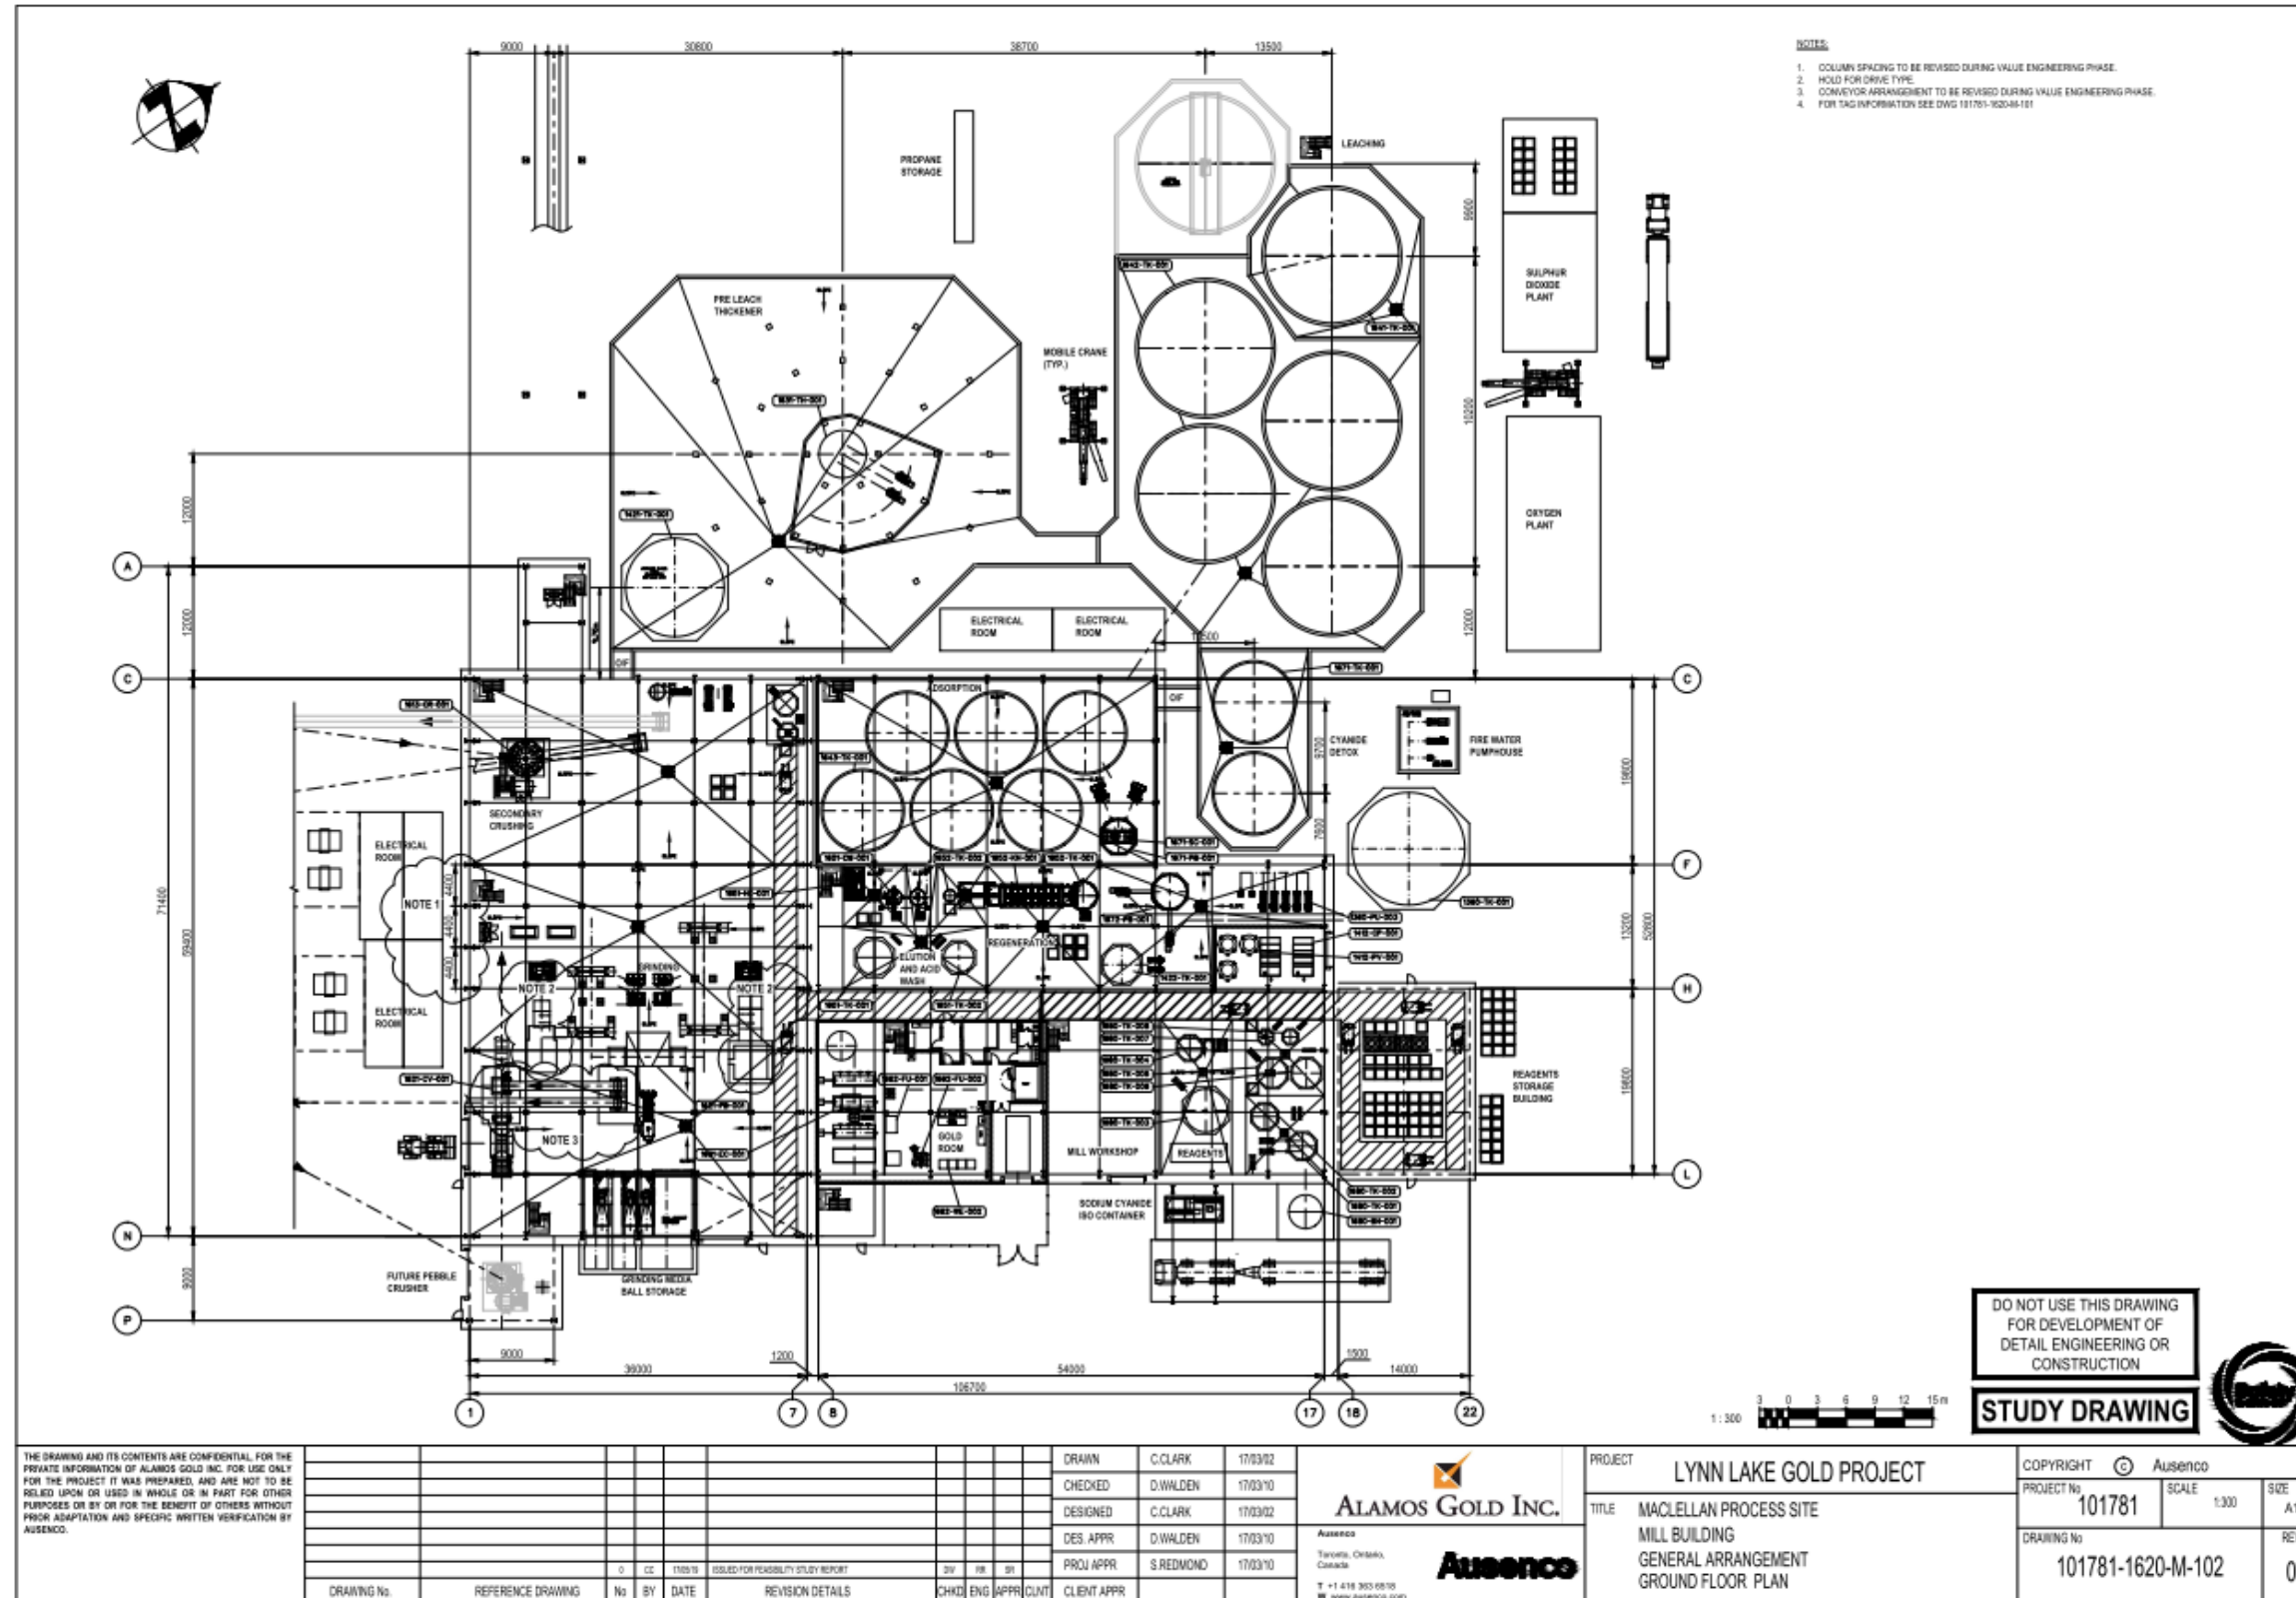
MacLellan Mill Building General Arrangement, Ground Floor Plan
